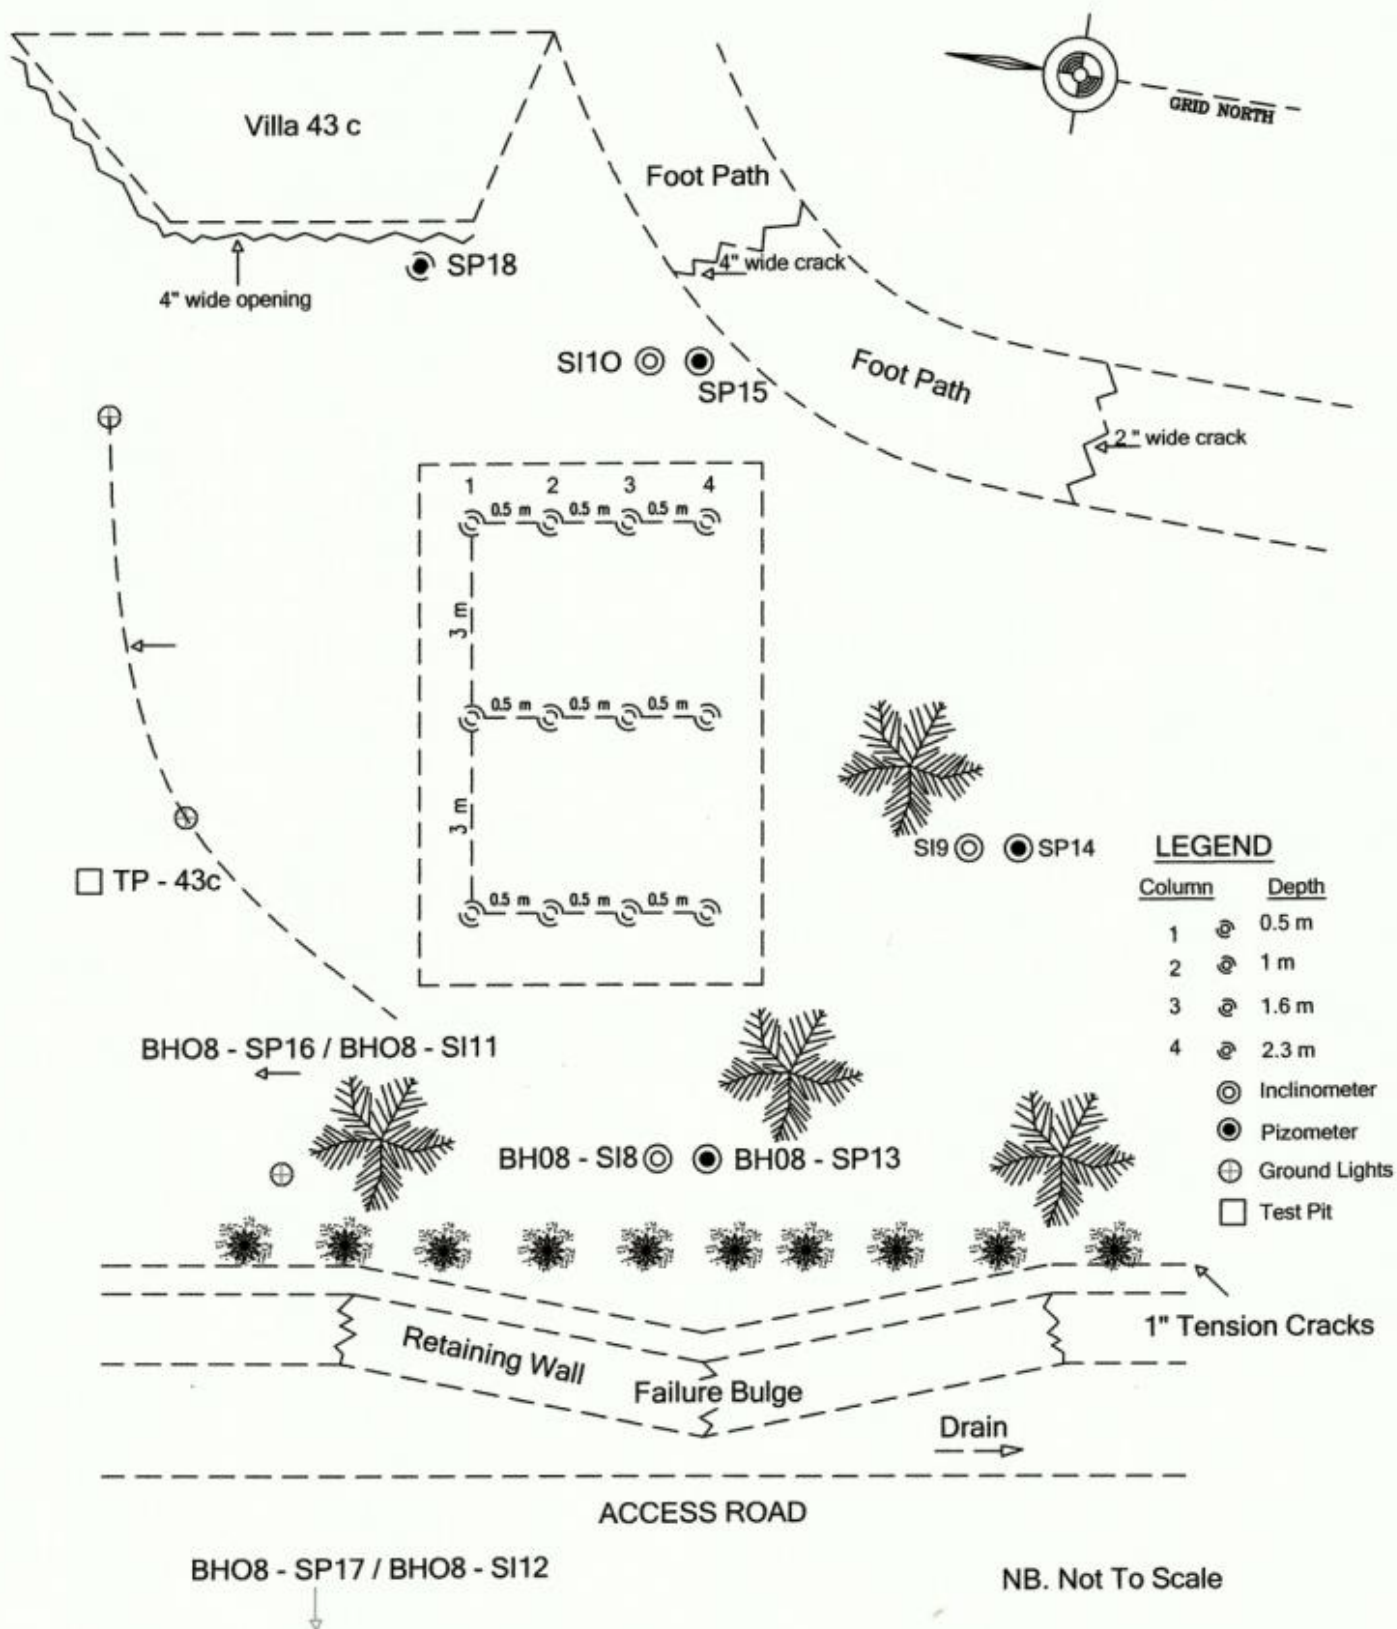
A Schematic layout of the Instrumentation at the Windjammer Landing Beach Resort Study Site
